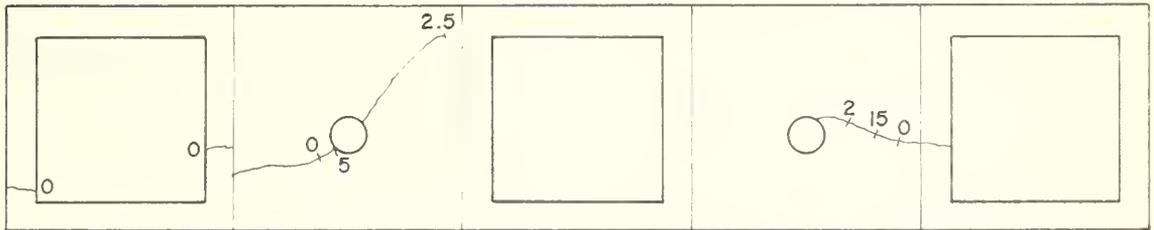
CRACK PATTERN IN BEAMS NO. 9 & 10
